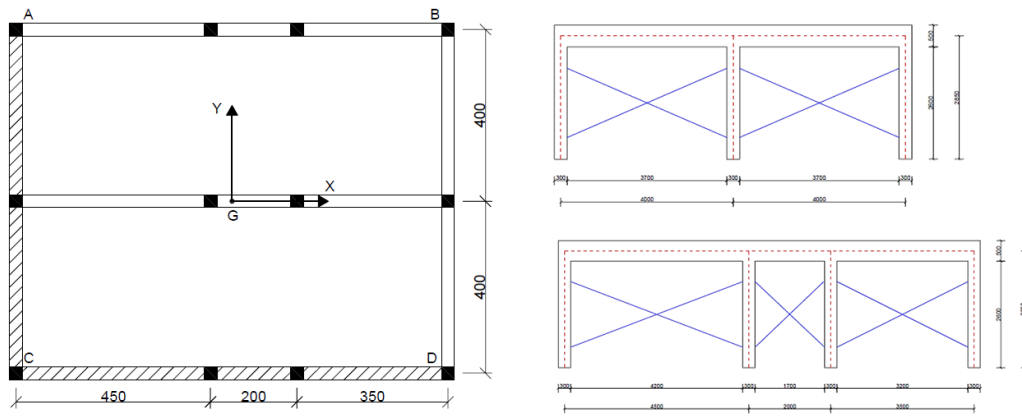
(a) Plan layout of two-ways asymmetric single story building structure with eccentric infills, (b) R/C frames with eccentric infill struts and shear-prone short columns.
